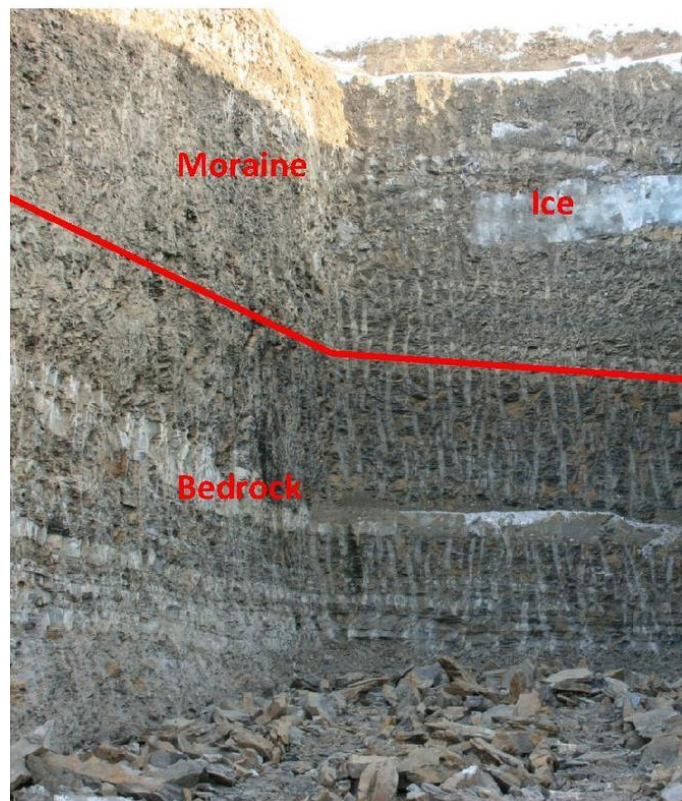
Open cut excavation. Photo: Sverre Barlindhaug.
